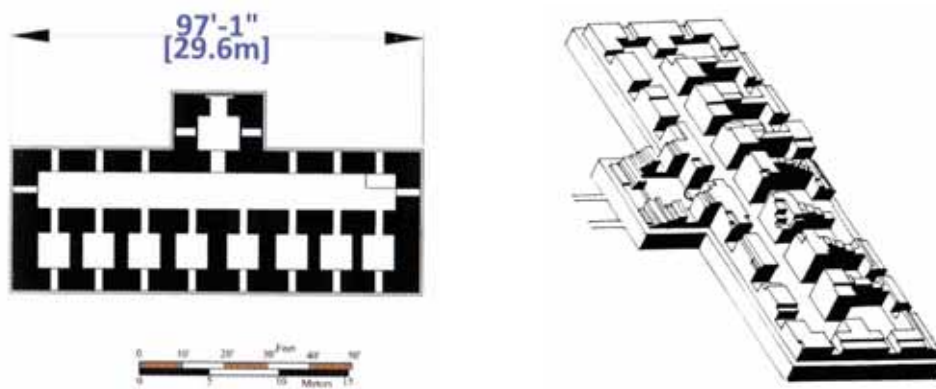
Ground plan and isometric drawing of monastery KKG₂, Beikthano, 4th century AD
